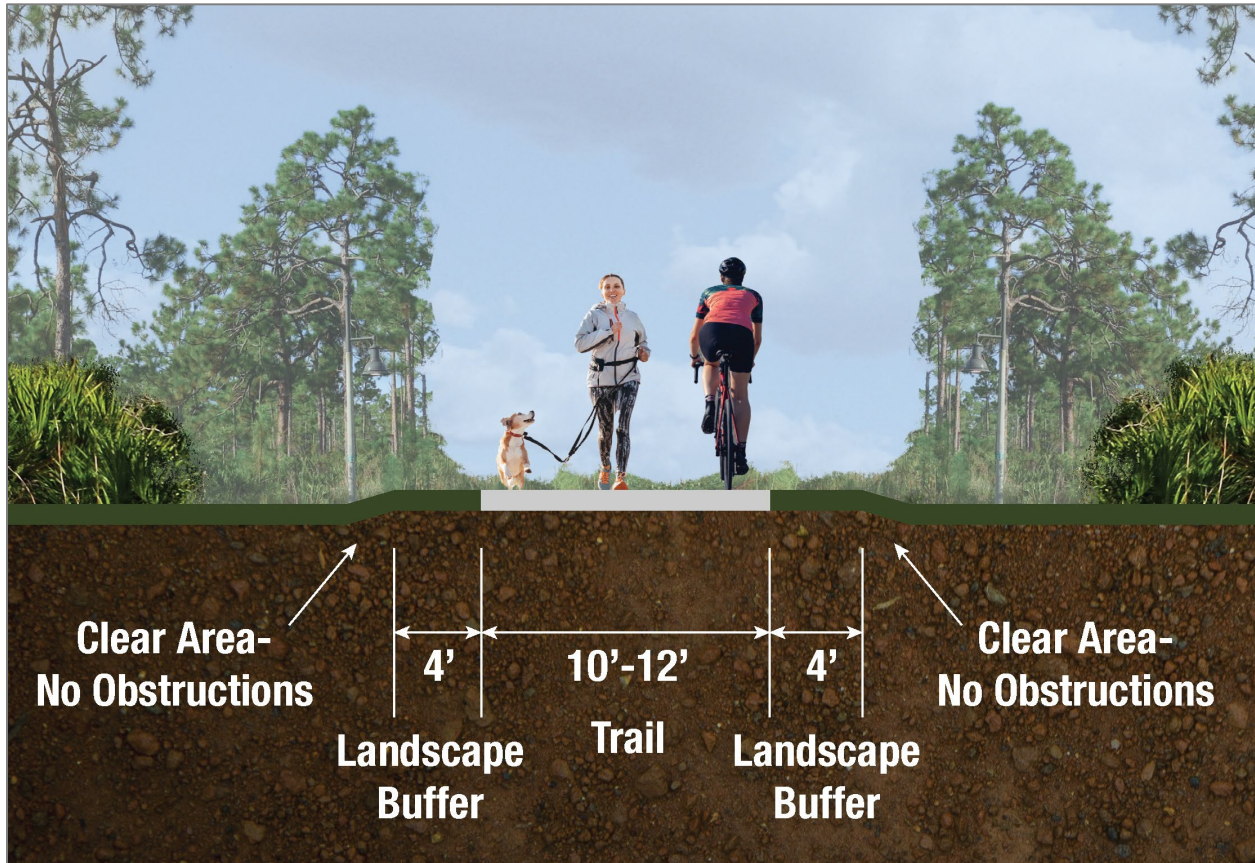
Conceptual Typical Section – Trail Adjacent to Canal
